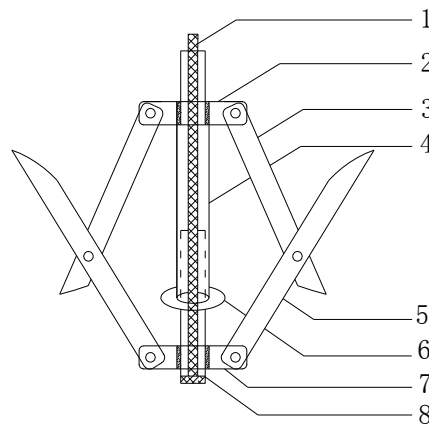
Structure diagram of the US ground anchor (adopted from Liu *et al.* 2009): 1 - Supporting shaft (steel bar or steel wire rope); 2 - Upper plate; 3 - Stretcher; 4 - Upper sleeve; 5 - Outwardly extending rib; 6 - Locking ring; 7 - Lower plate; 8 - Lower sleeve
